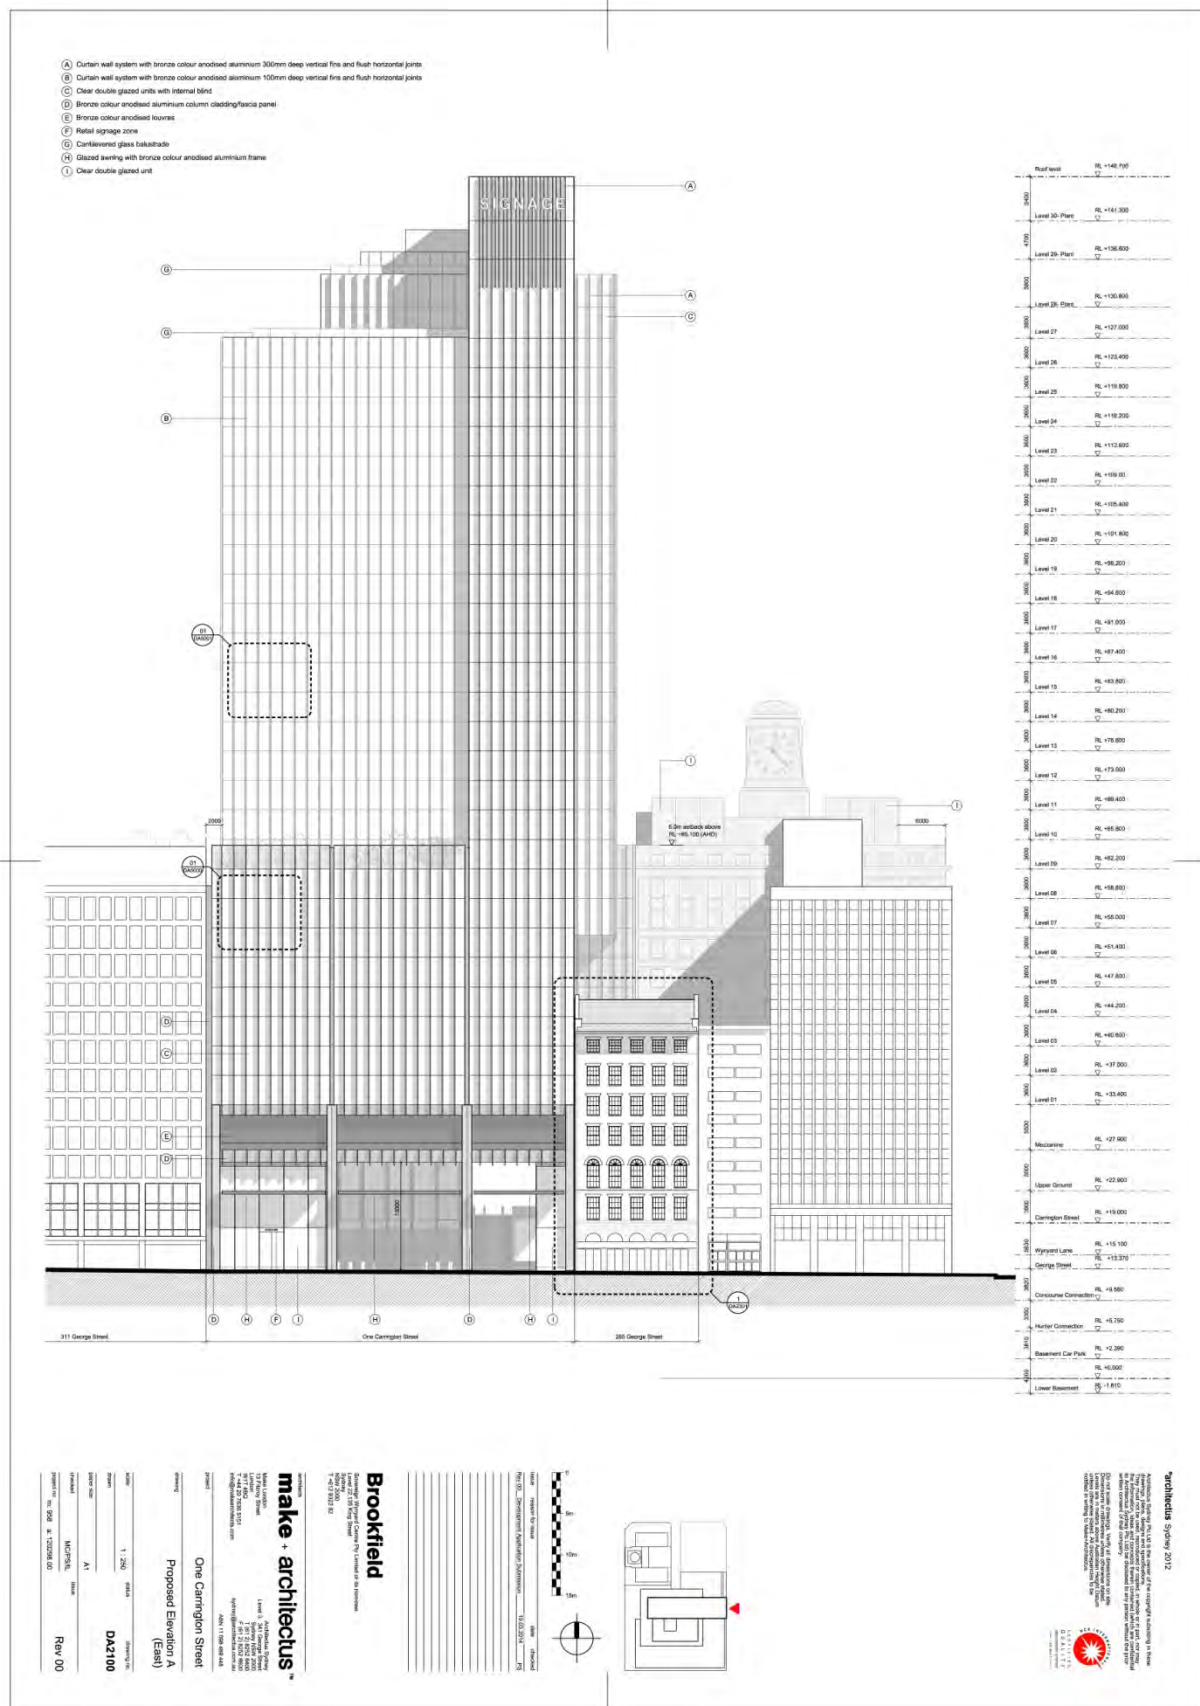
George Street elevation showing the proposed cantilever over Beneficial House. (Source: Make Architects/Architectus)
